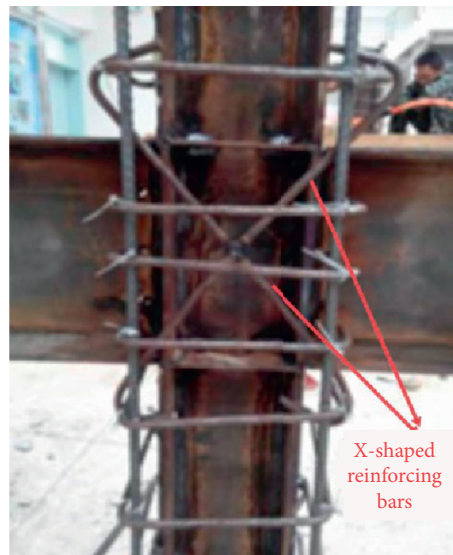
Details of X-shaped reinforcing bars and stirrups.
